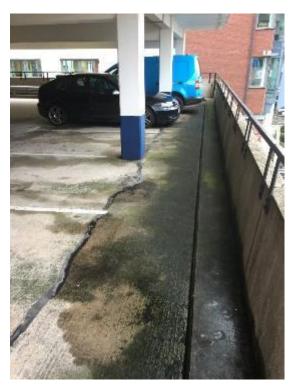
Southeast side of the car park looking toward the east corner of the car park Note continuous crack in deck spanning between columns, sealed with bituminous material
